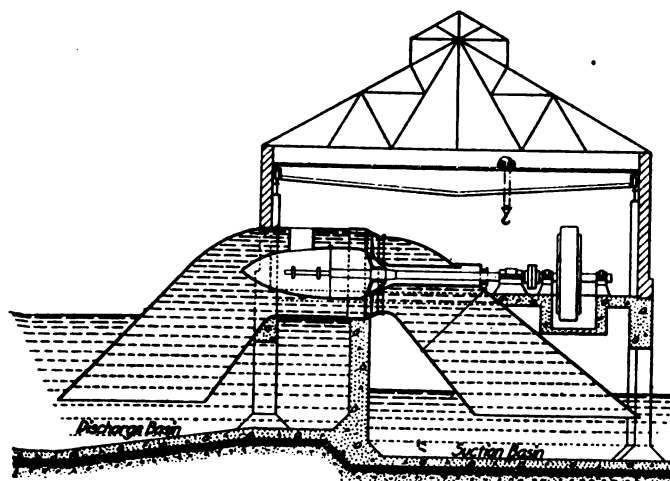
SECTION THROUGH 12-FT. WOOD SCREW PUMP
